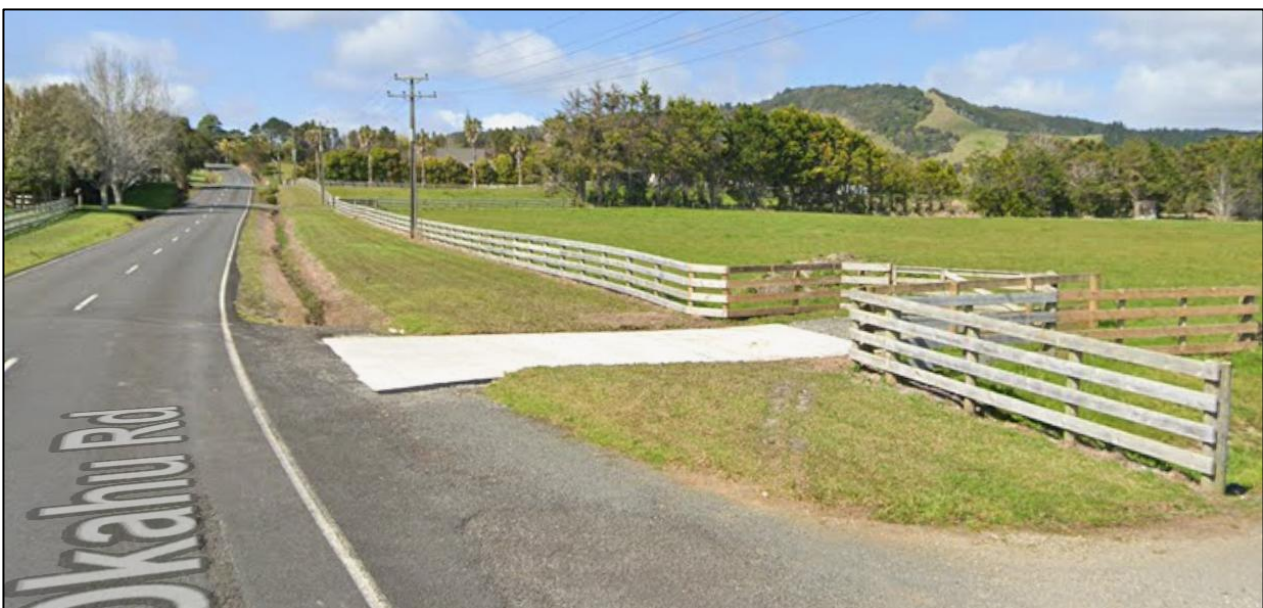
Google Streetview Imagery – view of Proposed Lot 1 existing vehicle crossing from Okahu Road, facing southeast.
